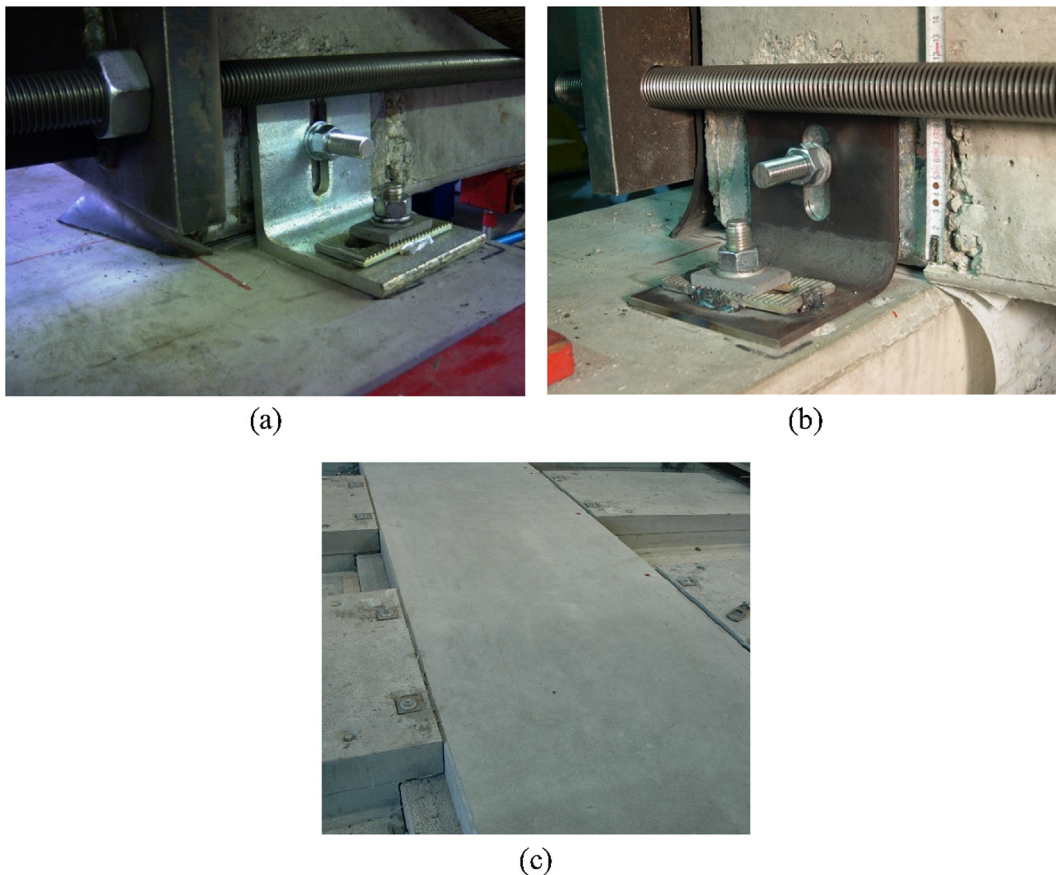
Typical roof-to-beam connections: (a) hot-rolled angles, (b) cold-formed angles, (c) dowels.
